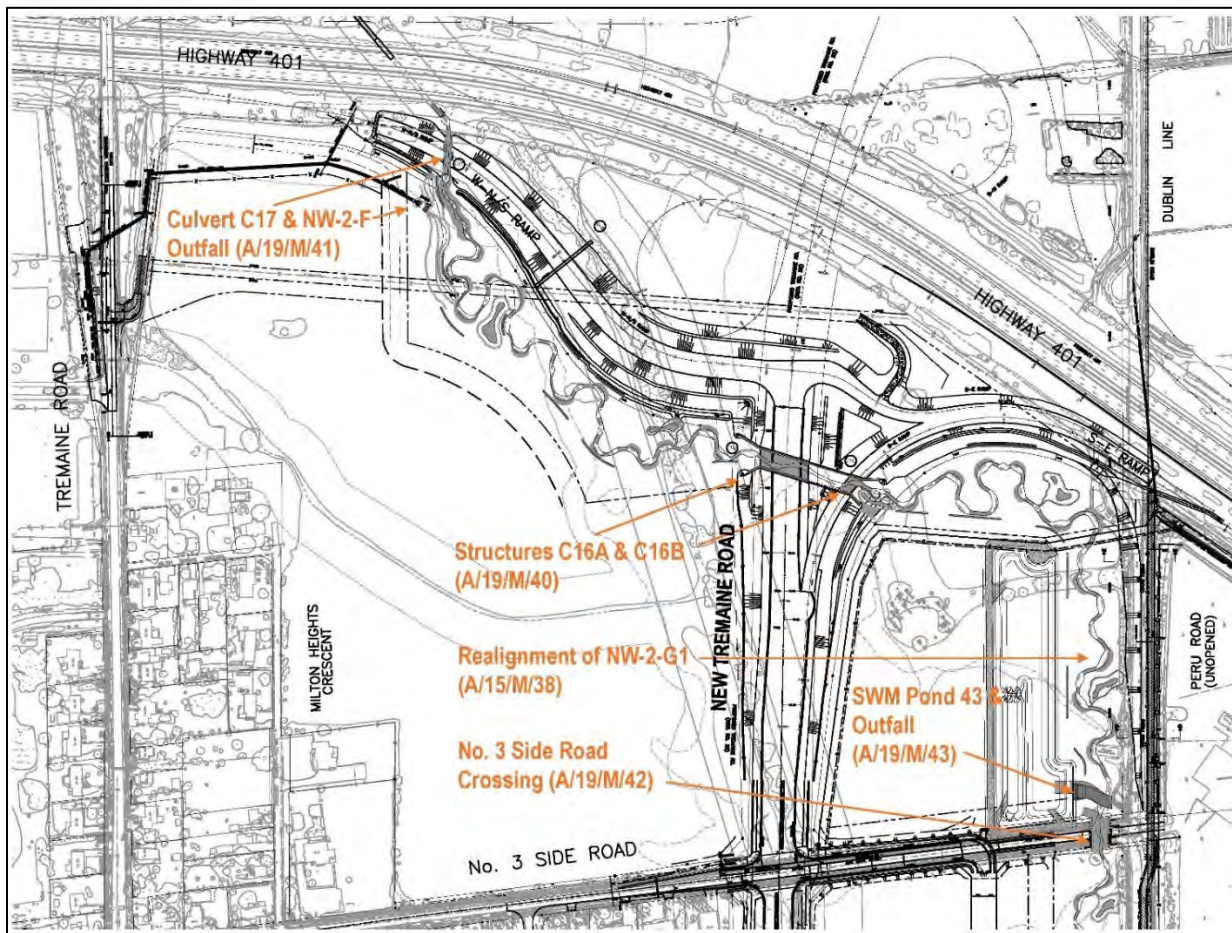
Proposed Construction of Tremaine Road with CH Permit File Numbers
